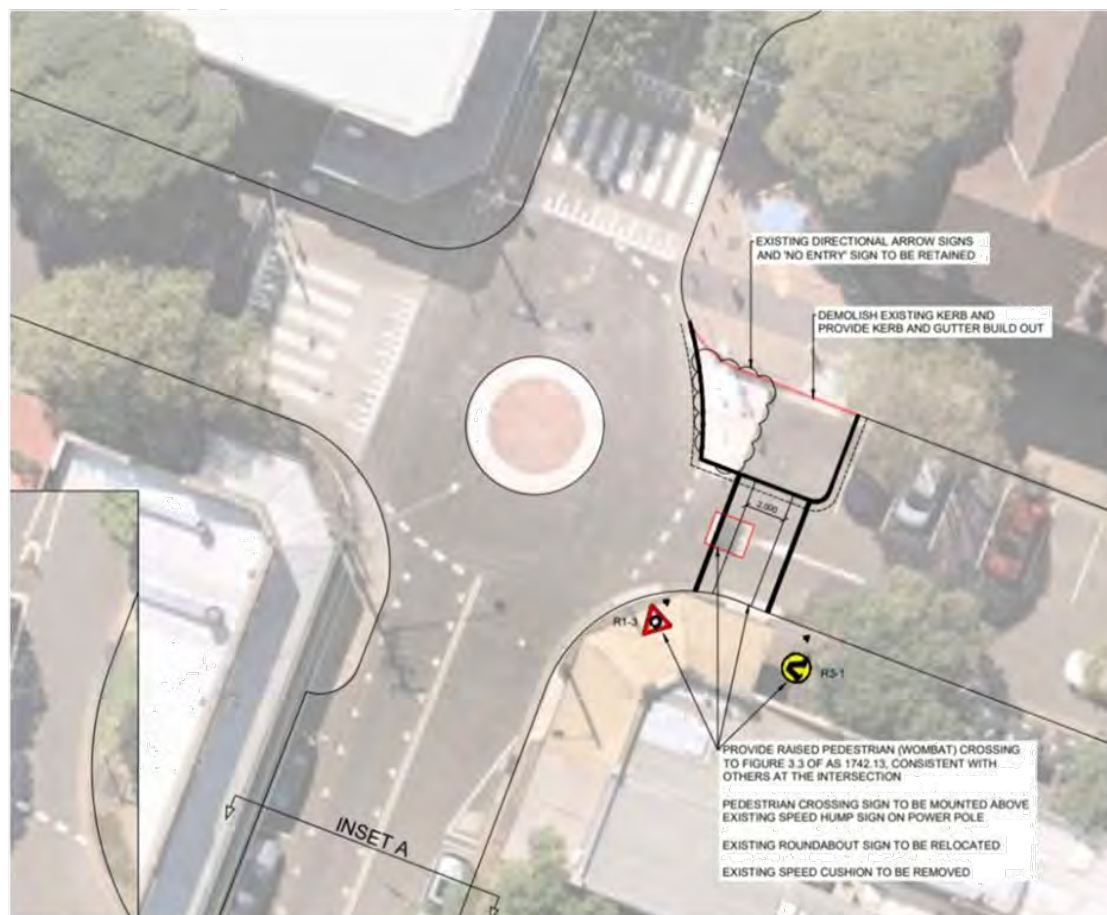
concrete island to be constructed on the east side of the intersection of Burlington Road and Rochester Street as per the recommendation of the Homebush Town Centre HPAA Study.
